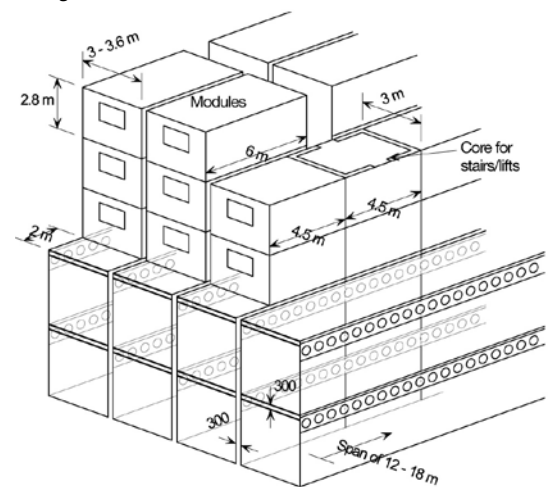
Modules supported by long spanning cellular beams to create open plan space at the lower levels
